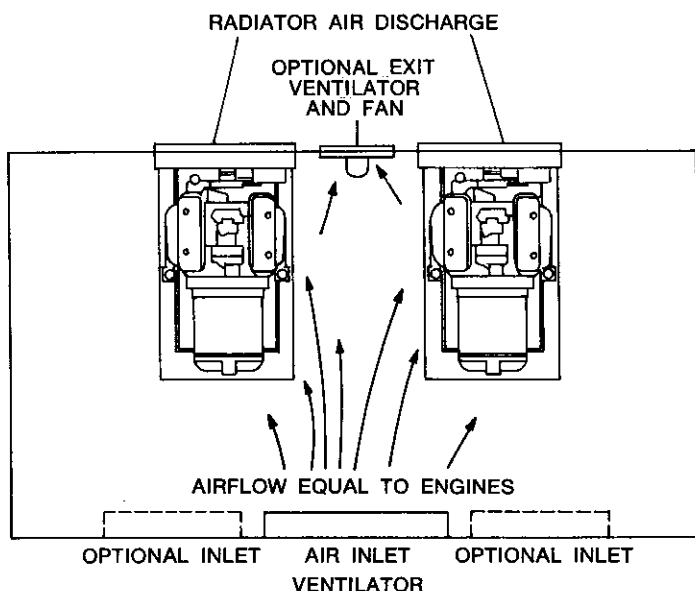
TYPICAL ARRANGEMENT FOR PROPER VENTILATION WITH MULTIPLE ELECTRIC SETS
